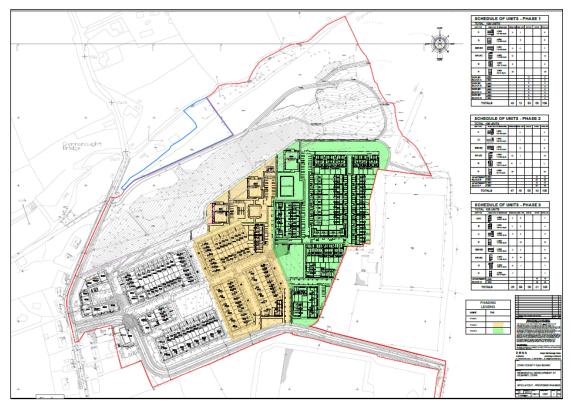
Proposed Phasing Plan (DMNA Architects)
